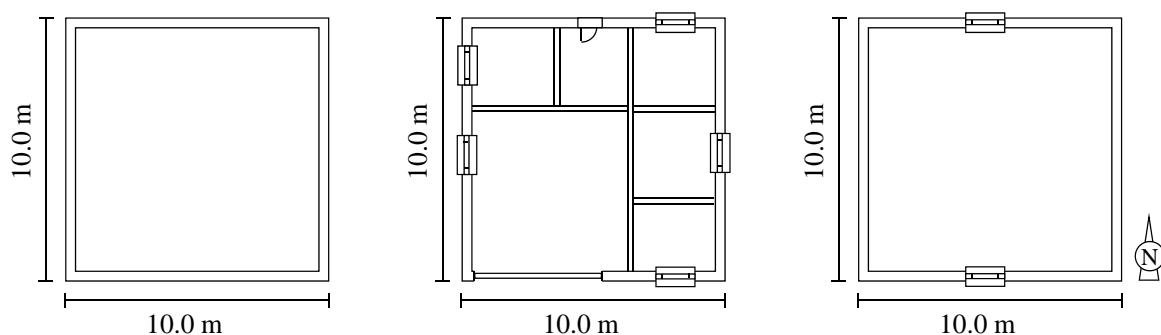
Basement of the Twin House. Figure 43. First floor of the Twin House. Figure 44. Second floor of the Twin House.
